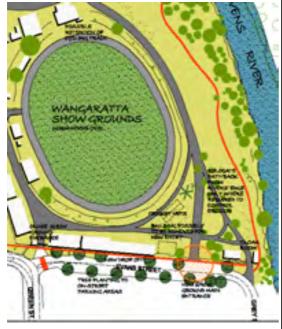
The relocation of the main entry to the Showgrounds as shown in the Parklands Master Plan
